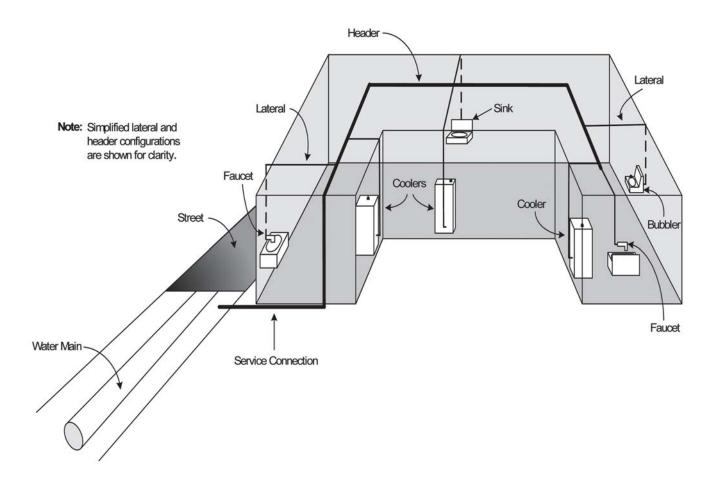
Plumbing Configuration for a Single-Level Building
